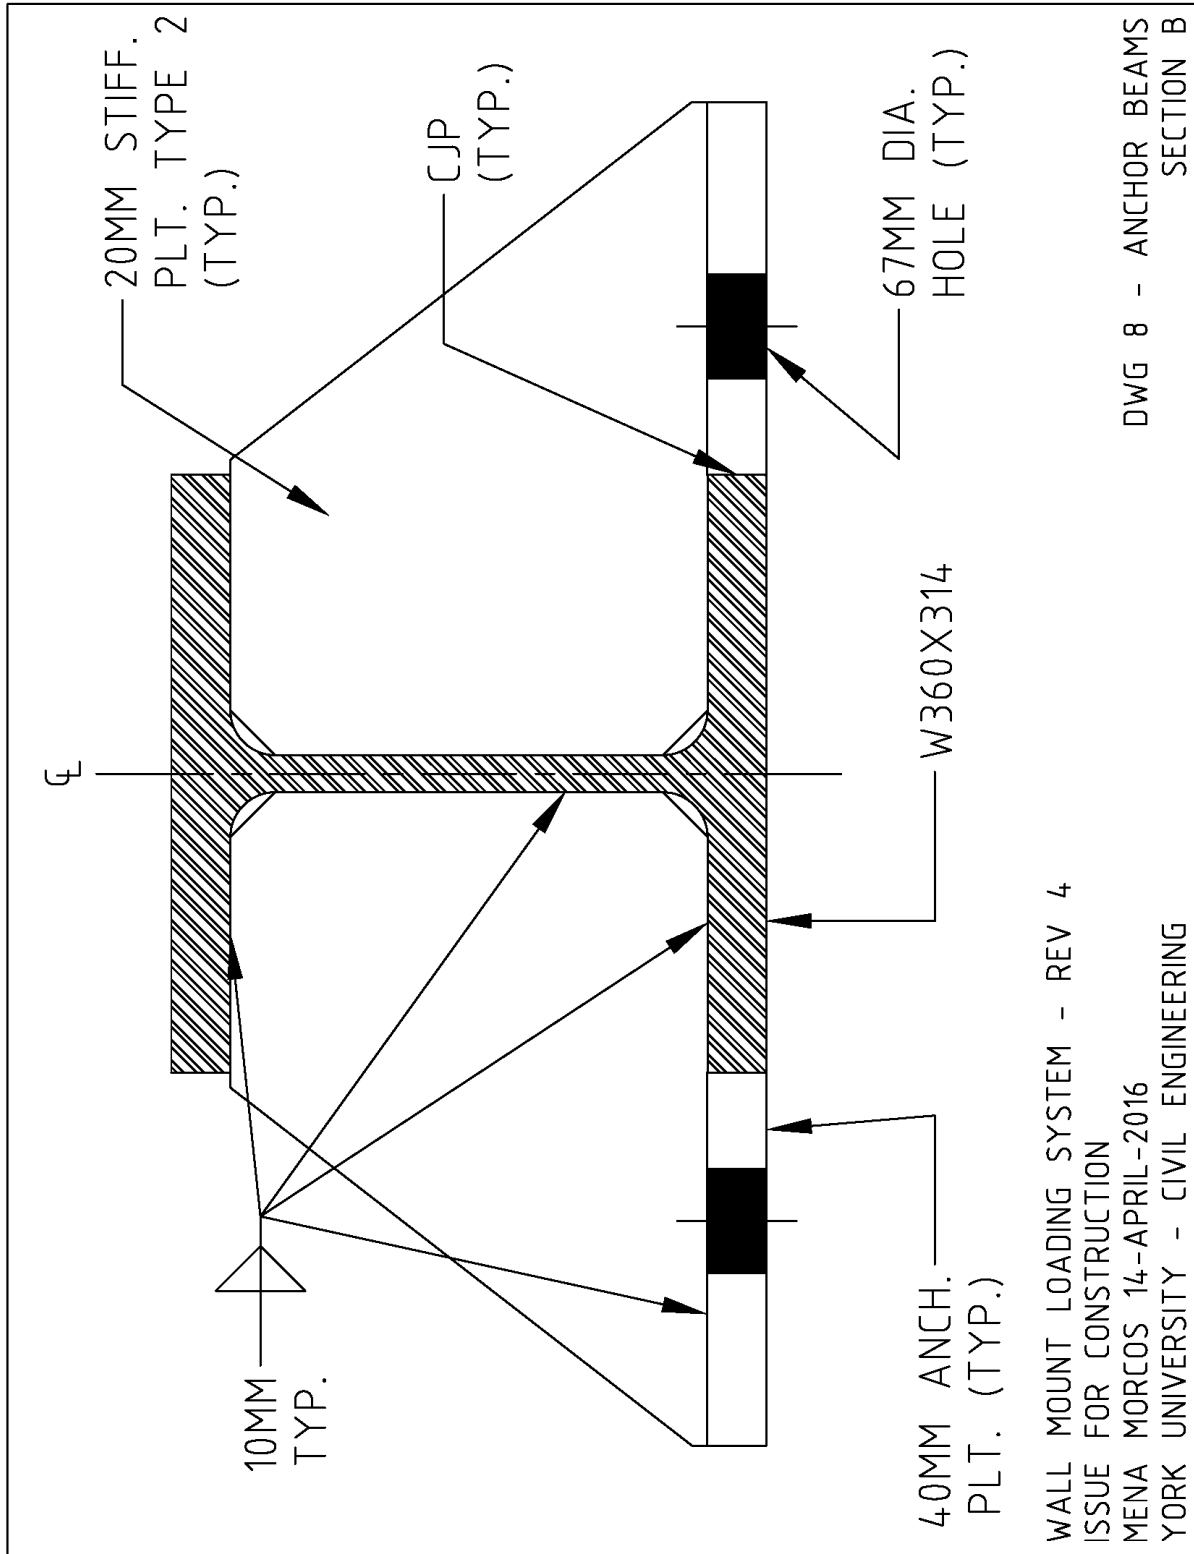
Wall mount loading system design and fabrication drawing – Drawing 8.
